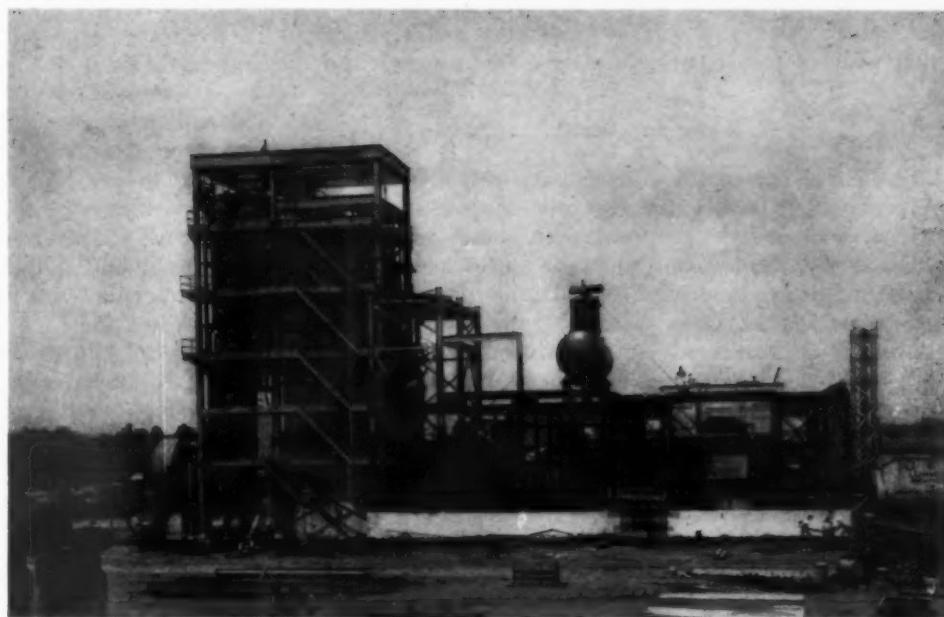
General view showing oil-storage tanks, cooling tower behind elevated water tank, elevated oil service tank, power plant and step-up substations
